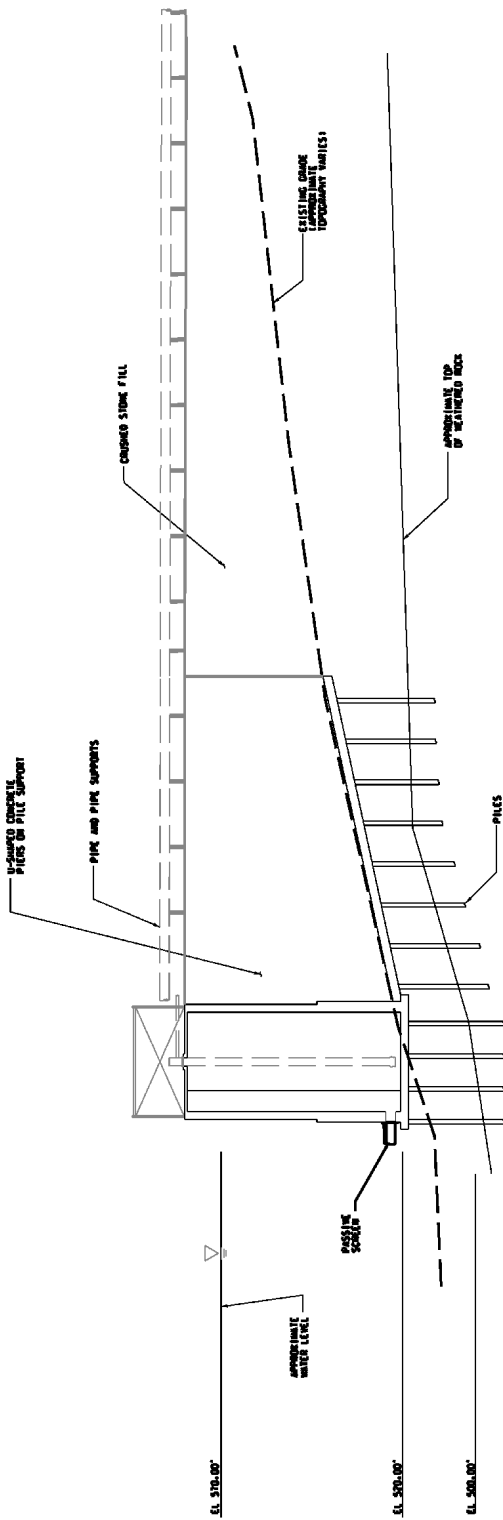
Side-Profile View of the Make-Up Pond B Intake Structure and Access Pier (Duke 2012h)
